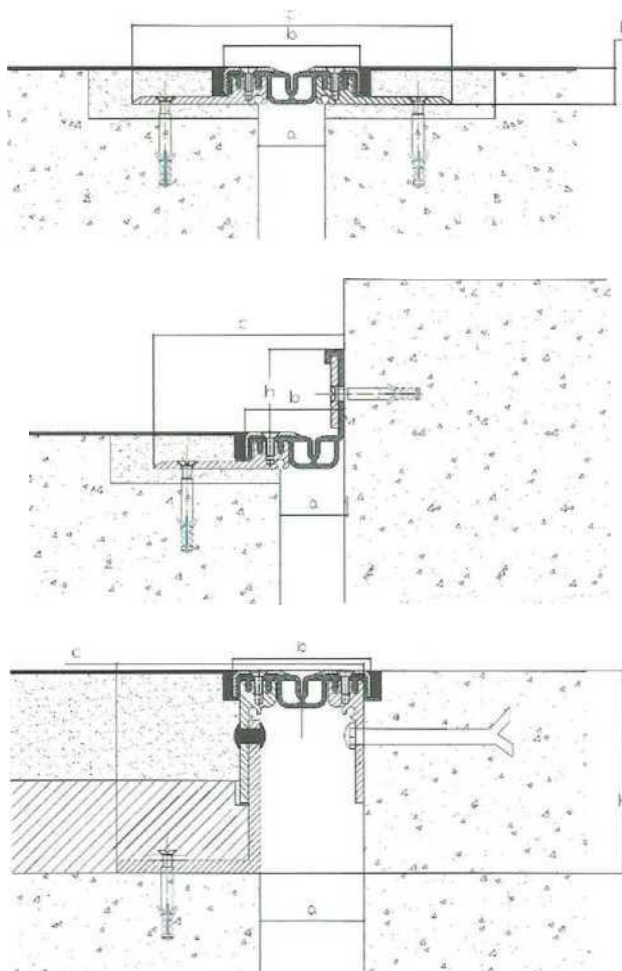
CONECTO PARK SL 190.30 waterproof expansion joint profile
